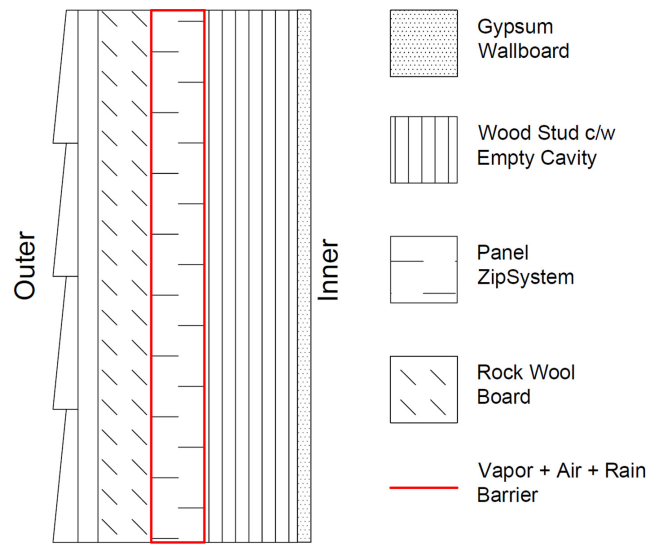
Design of the wall with external insulation, also called the perfect wall.
